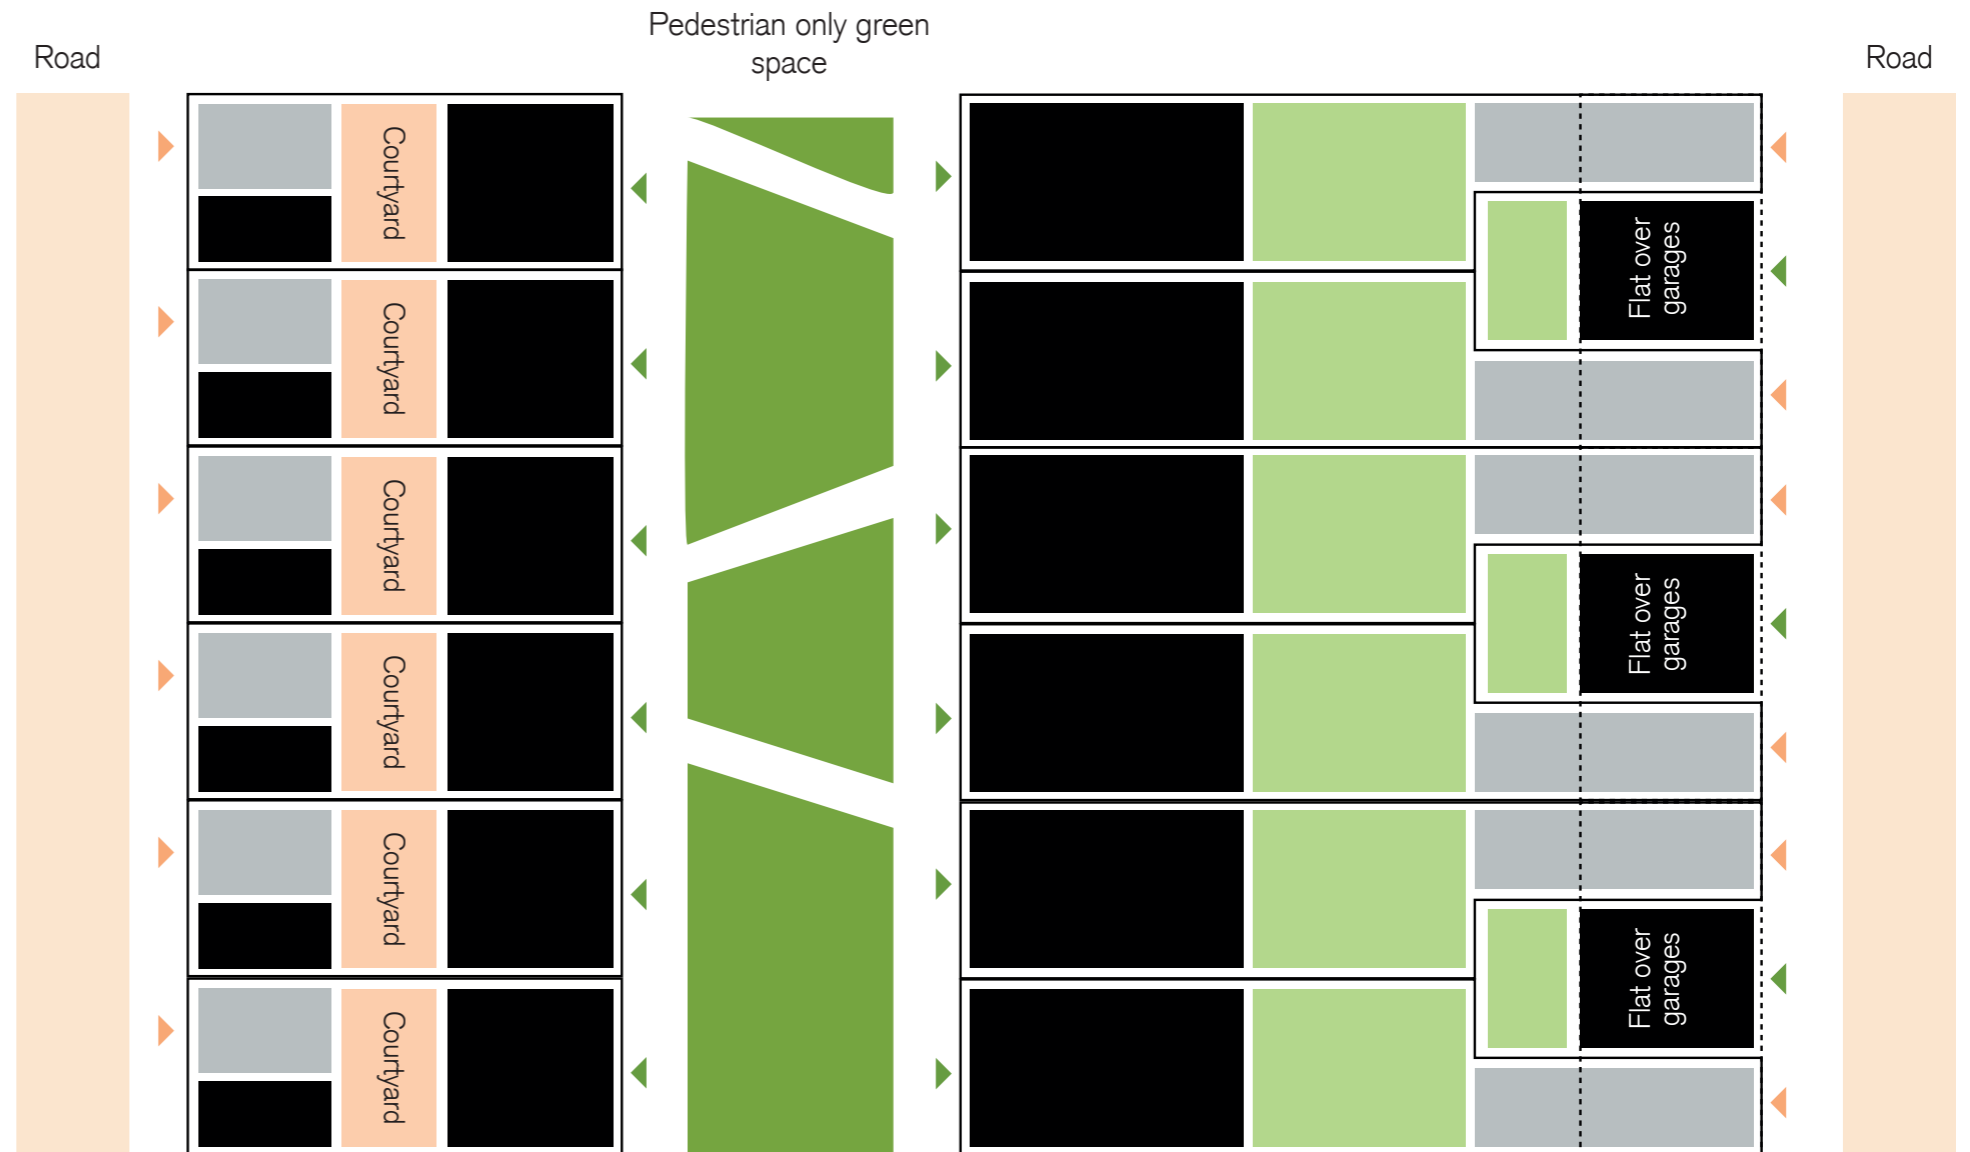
and 154 - A ground floor plan diagram of Knights Park illustrates how a pedestrian only space is facilitated by utilising house types with car access to the rear only, maintaining access for waste and refuse collection.
